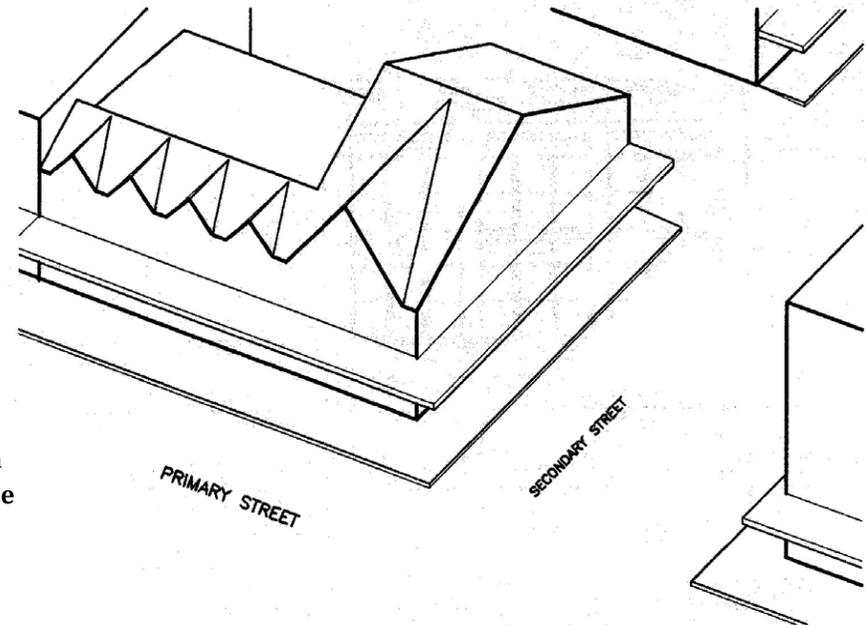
Increasing height at the corner allows a building to "hold the corner" and visually anchor the block at the intersection.
